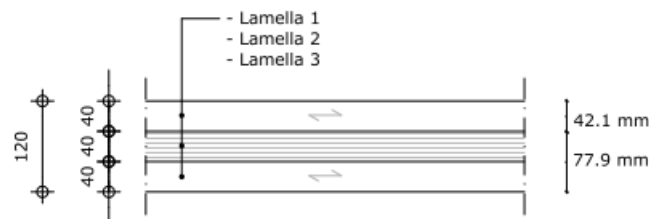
Lay-up for a 120 mm thick CLT bottom sheathing in mm
